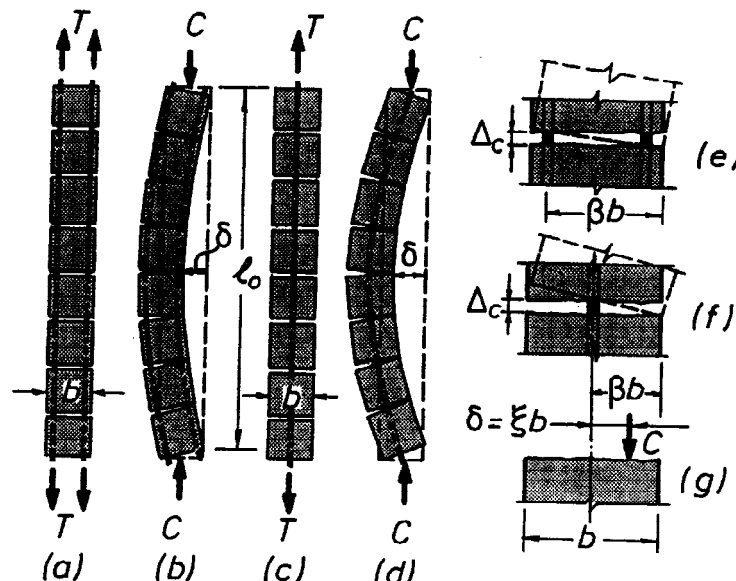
Crack developments and subsequent deformations leading to out-of-plane buckling in walls.
